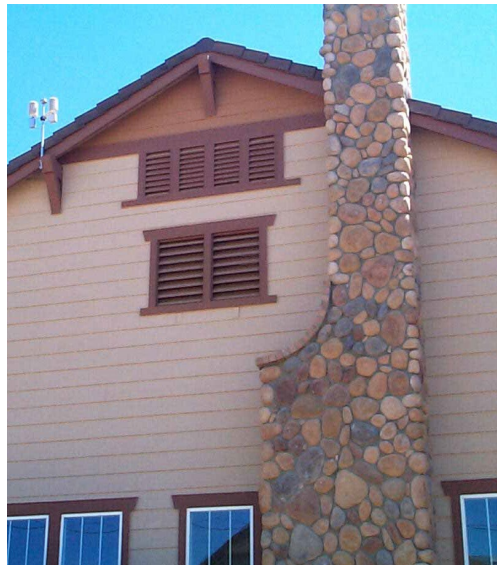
Central Fan Ventilation Cooling System (Outdoor Air Mode)
